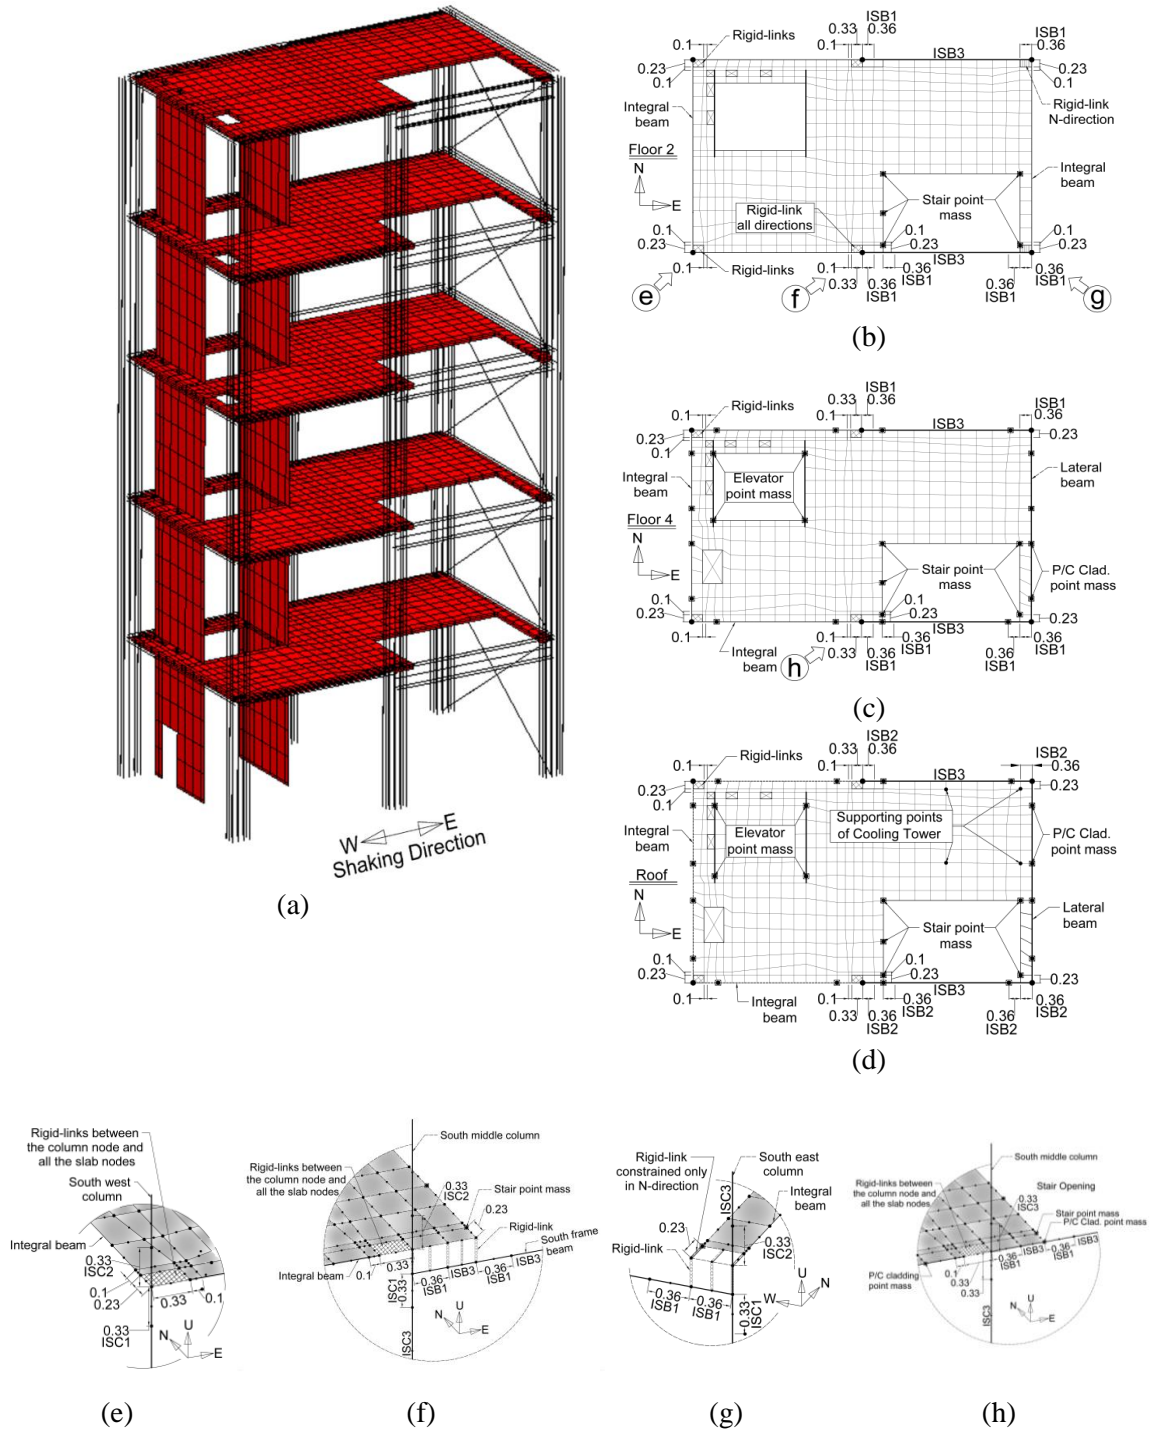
(a) Complete FE model of the test specimen structure; FE mesh details at (b) floor 2, (c) floor 4, and (d) roof; joint details at (e) south-west corner of floor 2, (f) south-middle of floor 2, (g) south-east corner of floor 2, and (h) south-middle of floor 4 (N: North, E: East, U: Up, and W: West; units are in meters).
